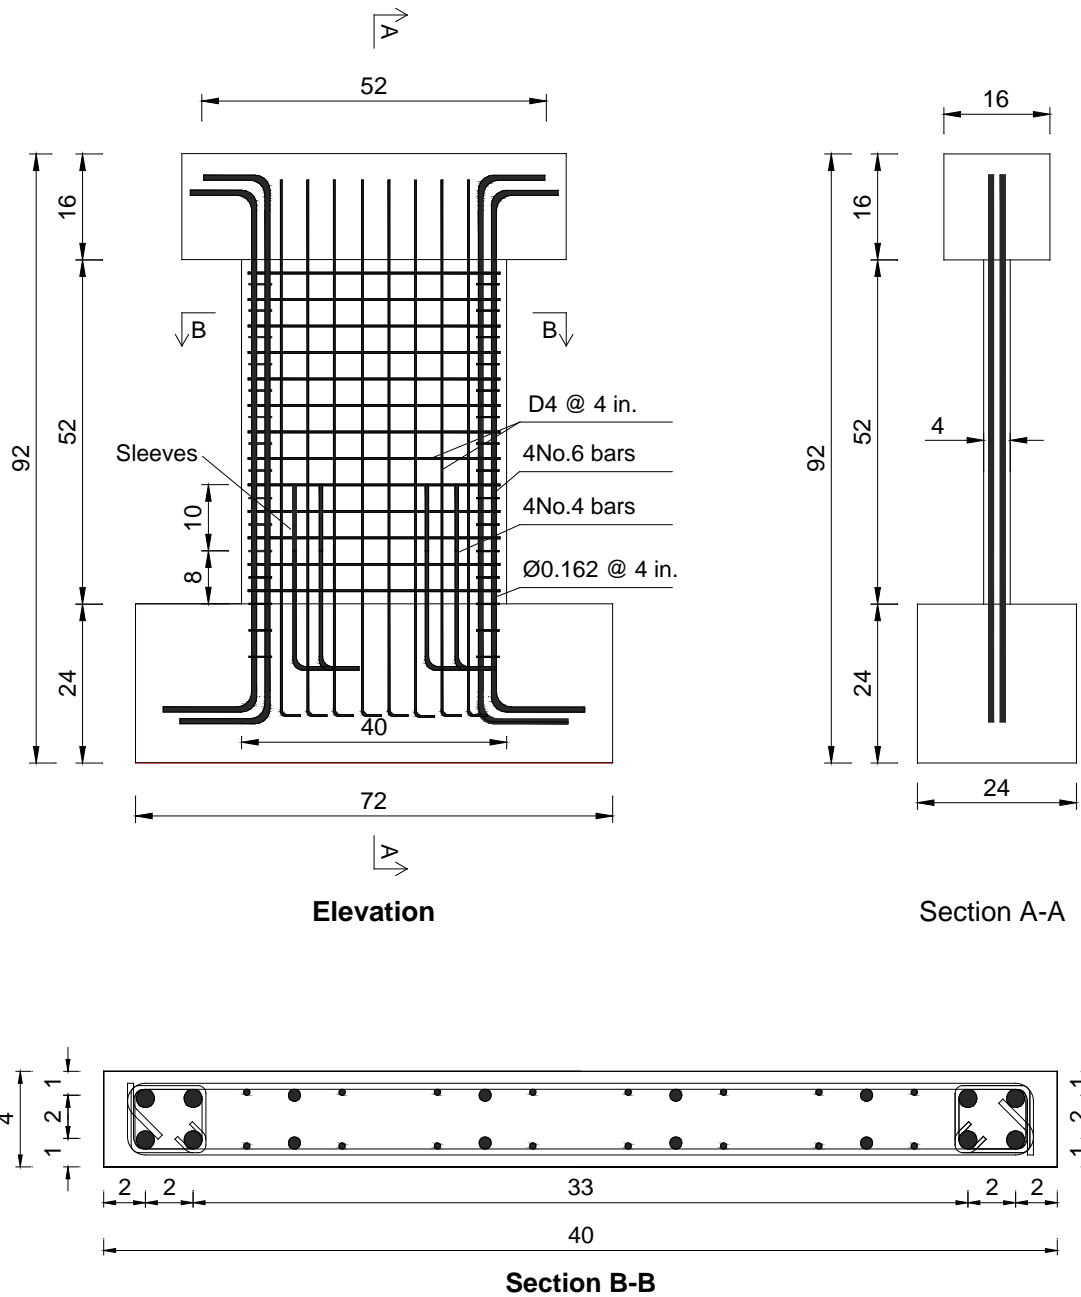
Reinforcement Layout in Specimens S7 and S8
